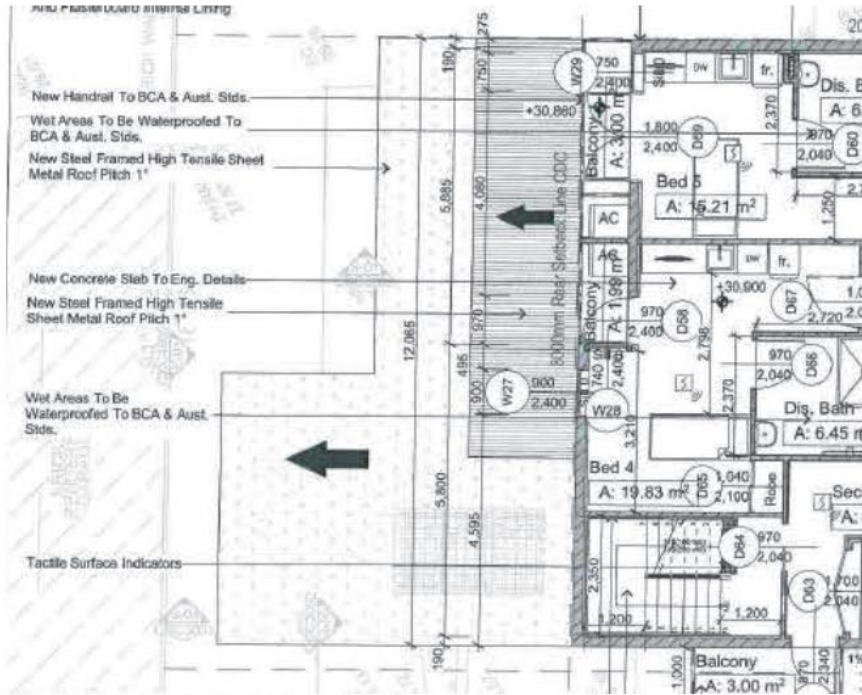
Extract of CDC2019/0461 approved second floor plan drawing no. CDC2003
